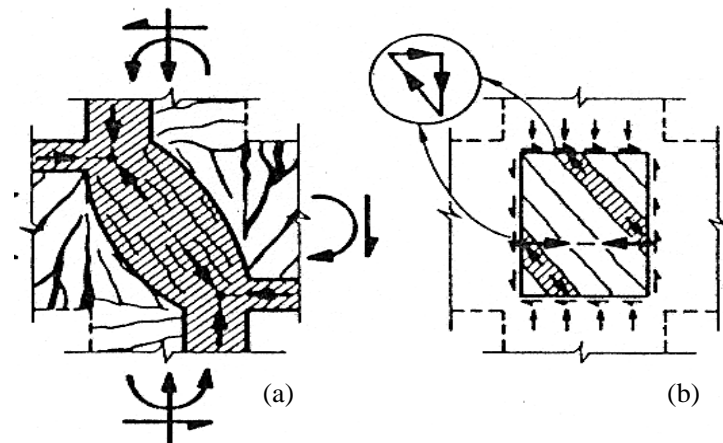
Paulay and Priestley mechanisms of shear transfer at an interior joint: concrete strut (a) and diagonal compression field (b). (Paulay & Priestley, 1992)
